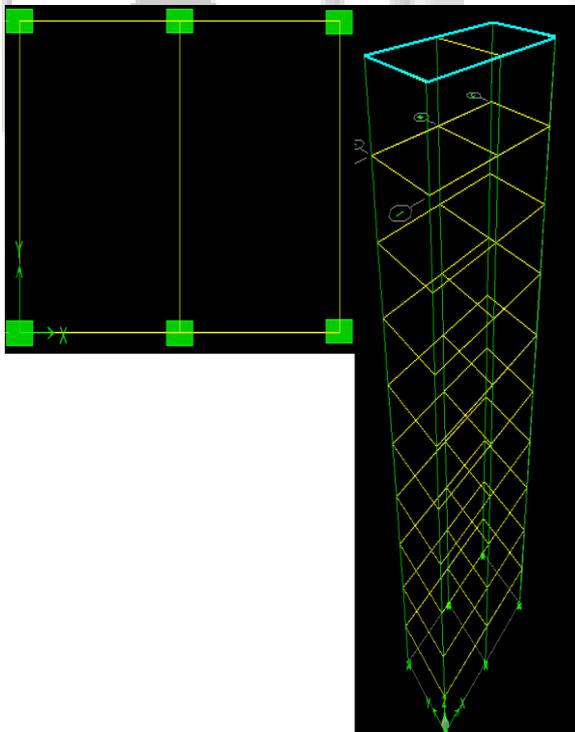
Plan view and elevation view of building 2 with base isolation
